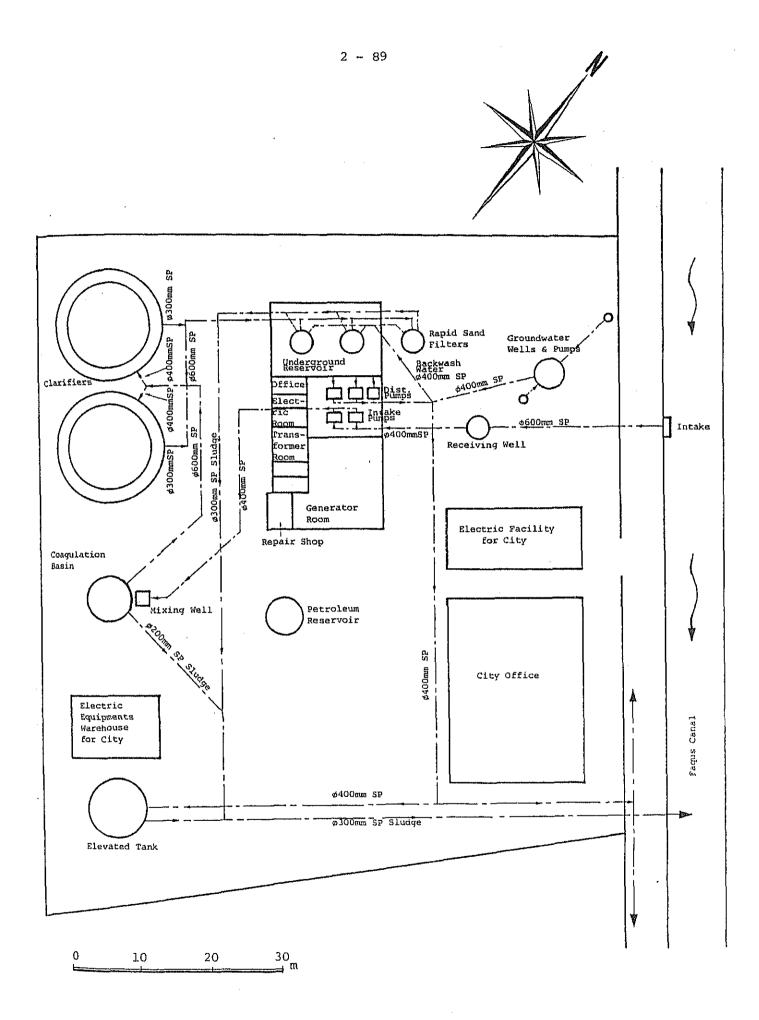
GENERAL PLAN OF FAQUE PLANT
